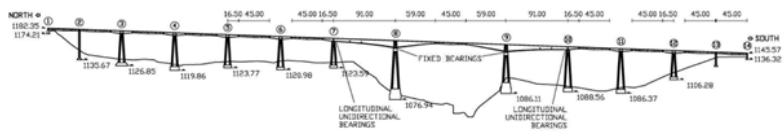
Elevation of the A22 Colle Isarco Viaduct. Dimensions in metres.
